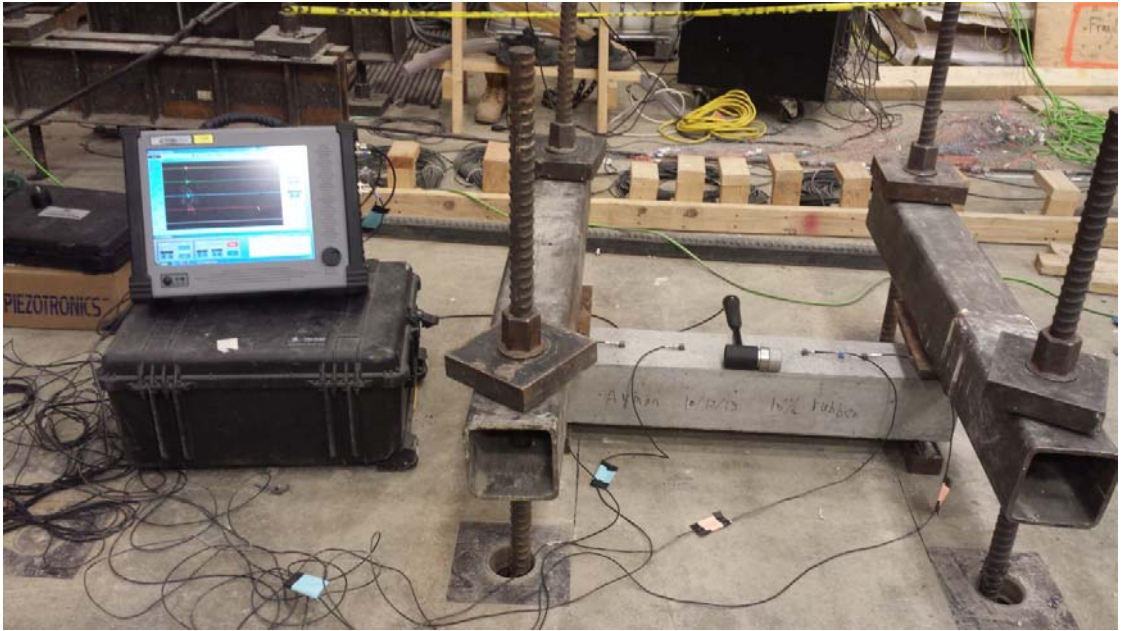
Initial test setup for impact hammer testing (the modified setup can be found in Paper II)
